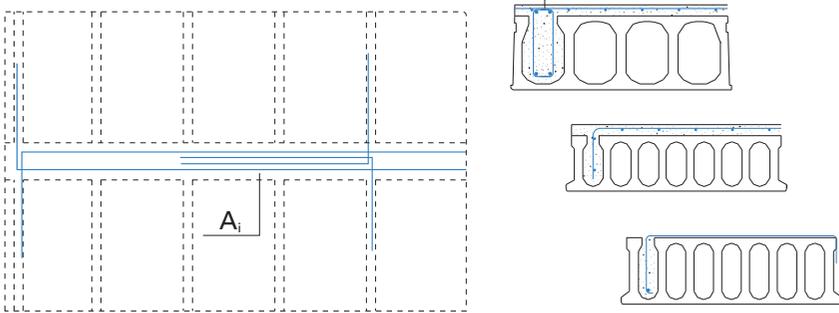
Edge tie bars incorporated in the hollow core slab or in the final longitudinal joint in presence and absence of concrete topping.
